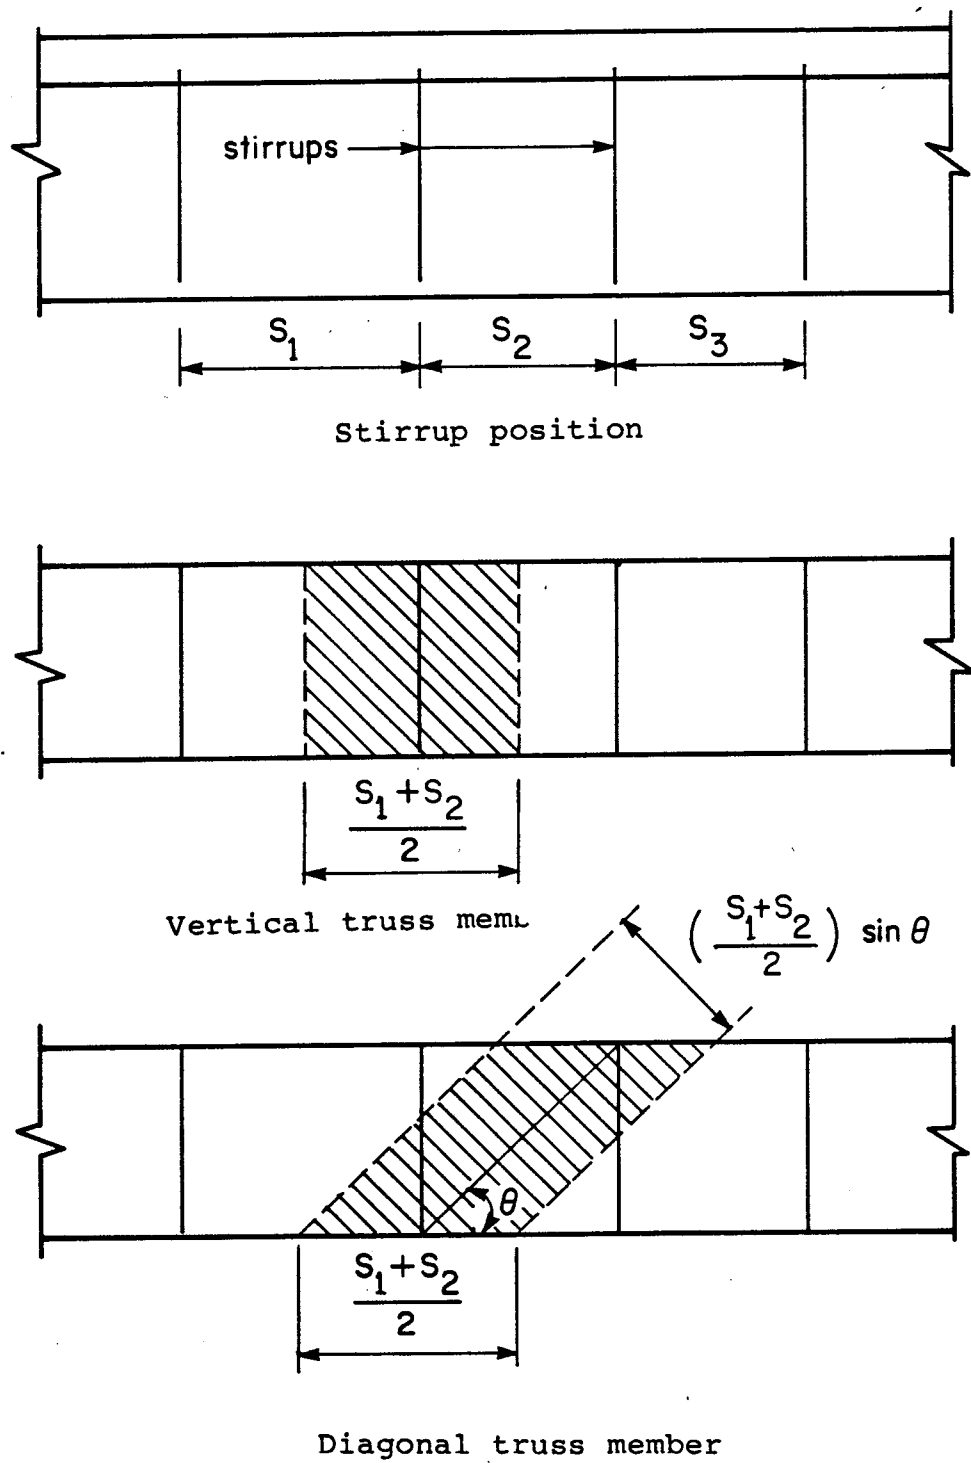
Beam Stirrup Position and Corresponding Web Members.
